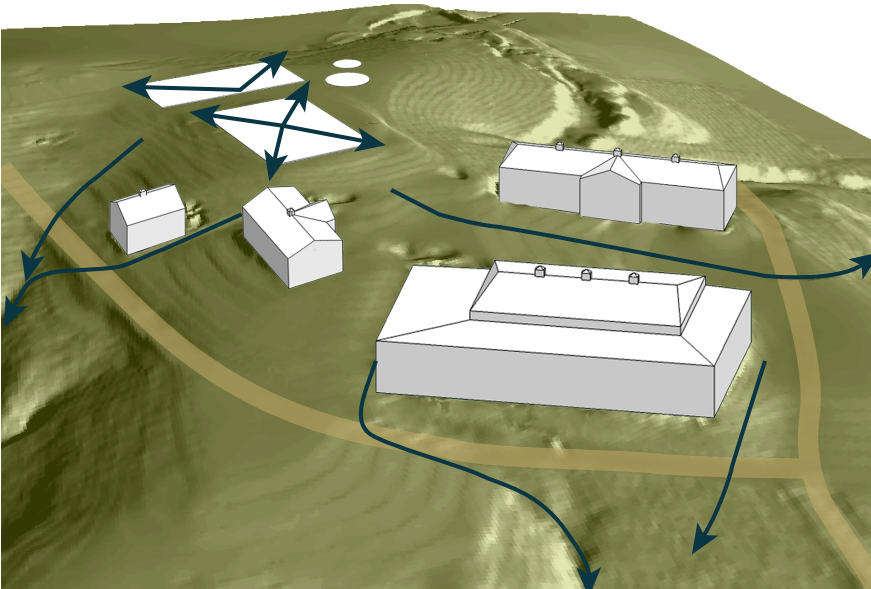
Alternative B 3D Massing / Drainage Study looking Southwest
